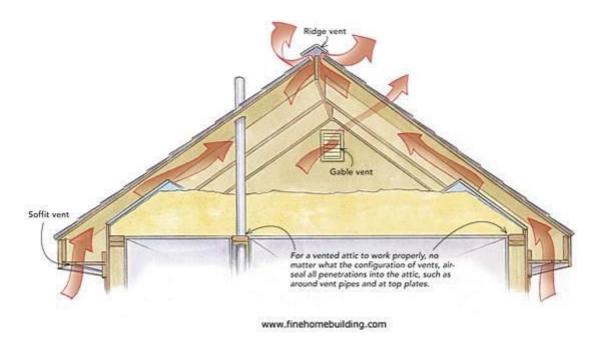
A schematic of vents used to ventilate an attic space from <u>www.finehombuilding.com</u>. It is common to have at least one outlet vent type, for example gable, ridge or soffit.
